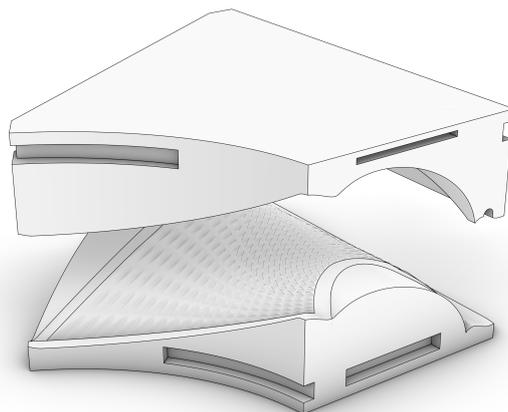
Schematic drawing of double-sided 3DP formwork with interlocking details.
